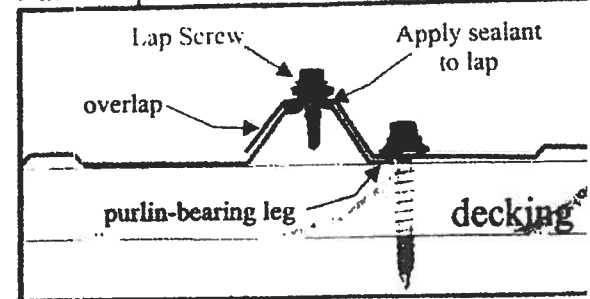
On low-pitched roofs butyl tape or caulk should be applied at the panel lap to keep water from overflowing the lap. Note that the *underlap* side of the panel has a short purlin-bearing leg that rests on the roof decking.
